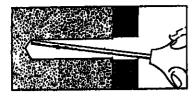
HSL METRIC CONCRETE ANCHORS
